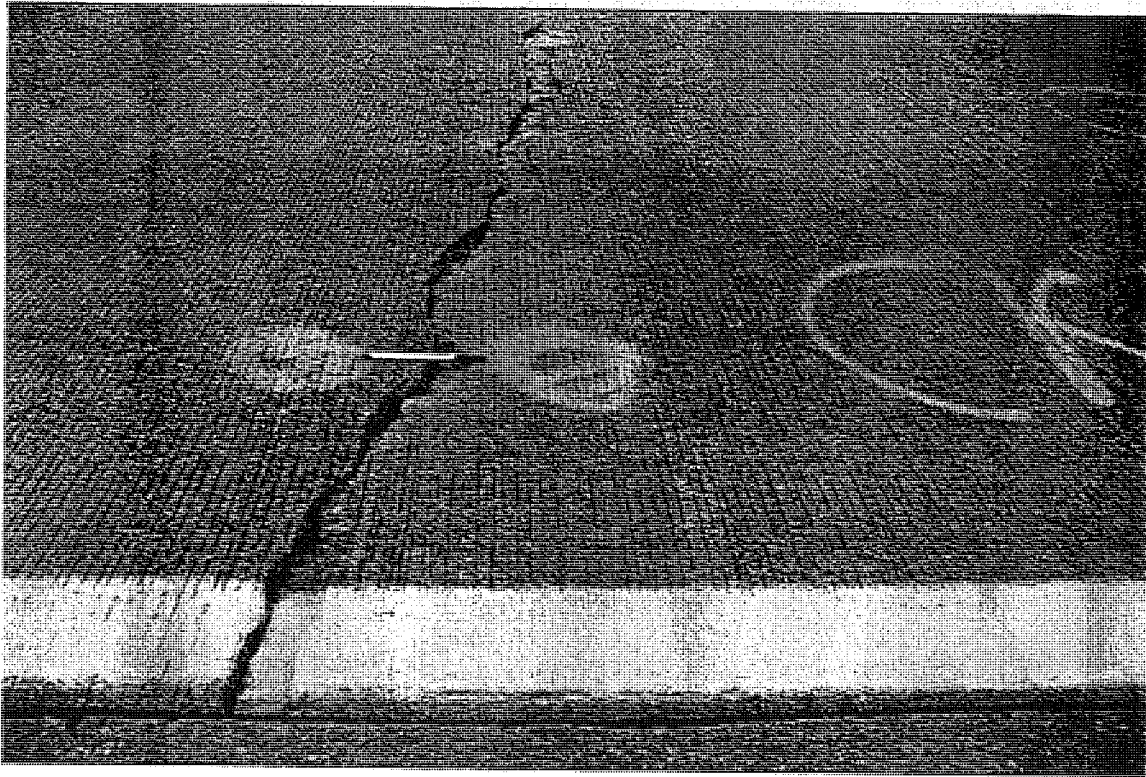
A typical transverse crack on CSN# 77024-20821A (Section A), EB, showing severe spalling and faulting.
